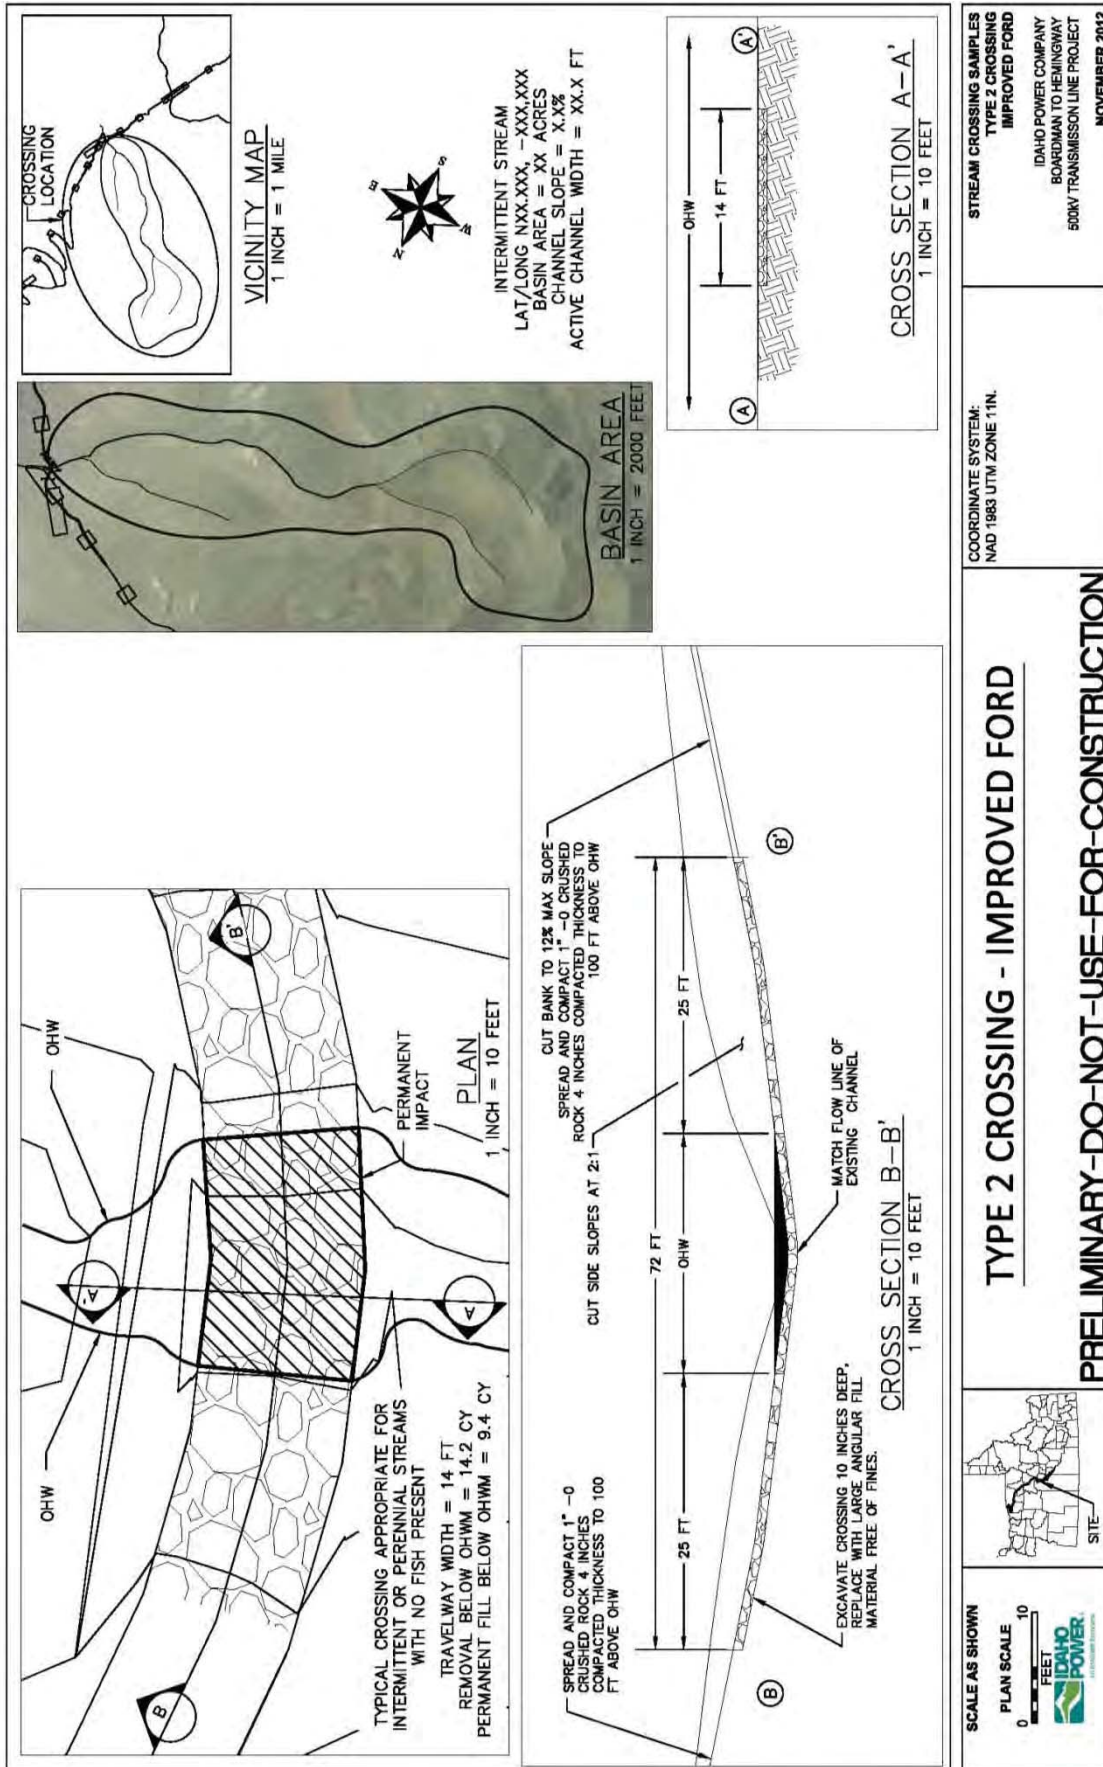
Typical Site Plan and Cross Sections: Type 2 Crossing: Improved Ford
